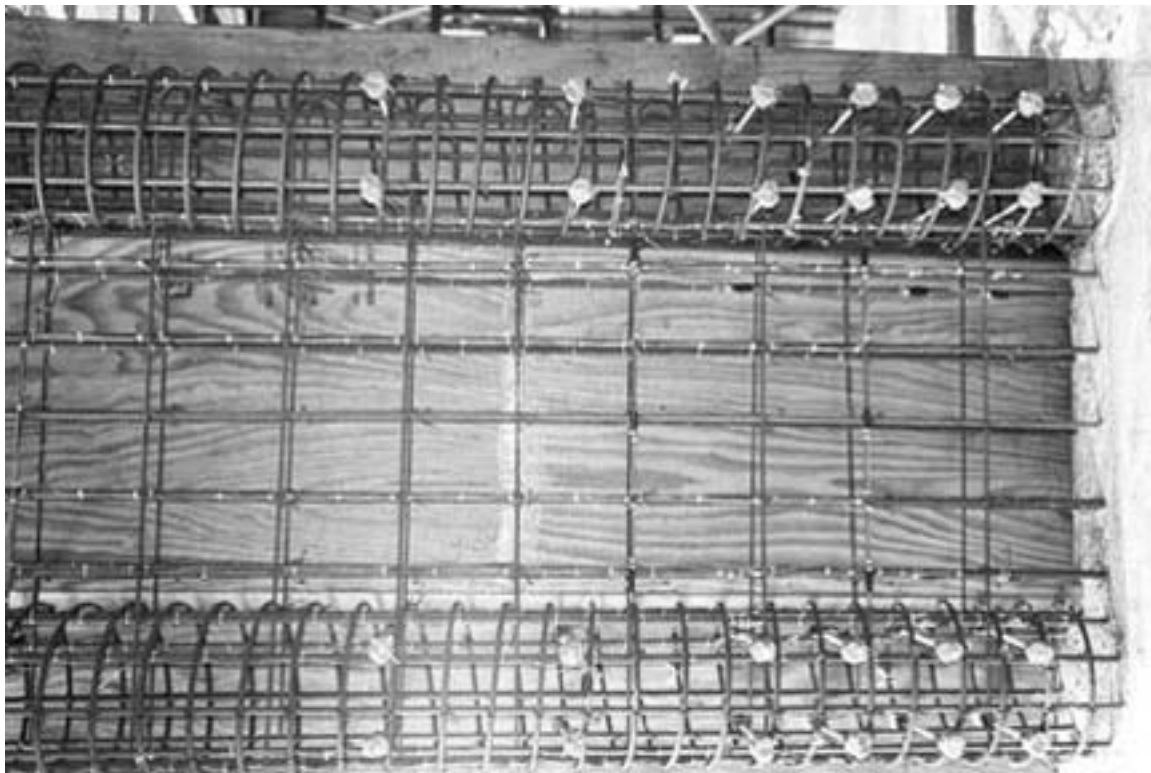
Test Unit 1B: Reinforcement detail. Transverse bars are spaced vertically at  $s = 8$  in. [203 mm].
